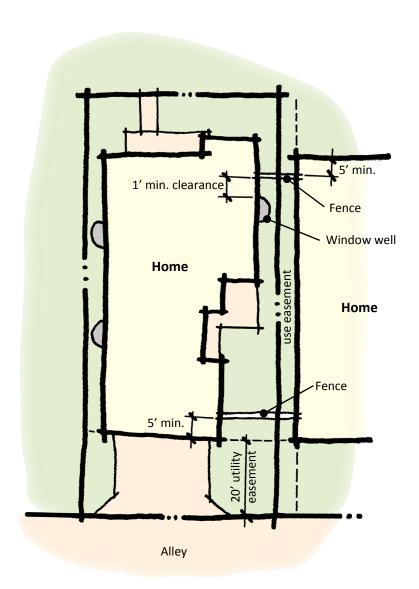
Example B - Fence Location for Alley-load Lots
